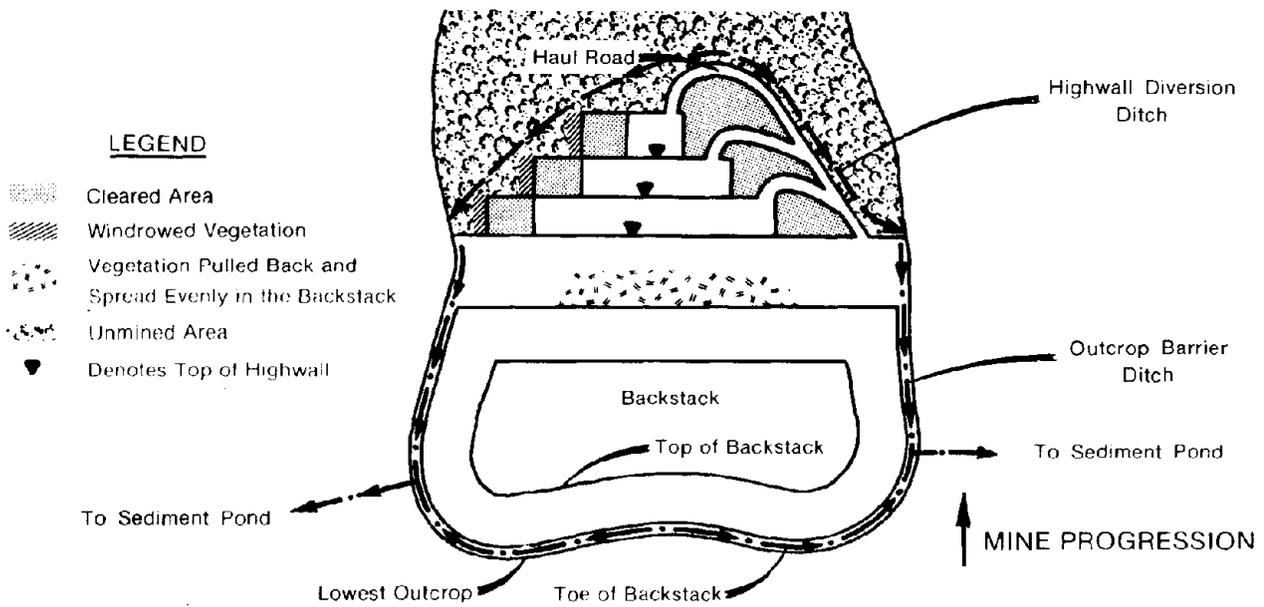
Drainage ditches for contour, auger and shortwall mining.
